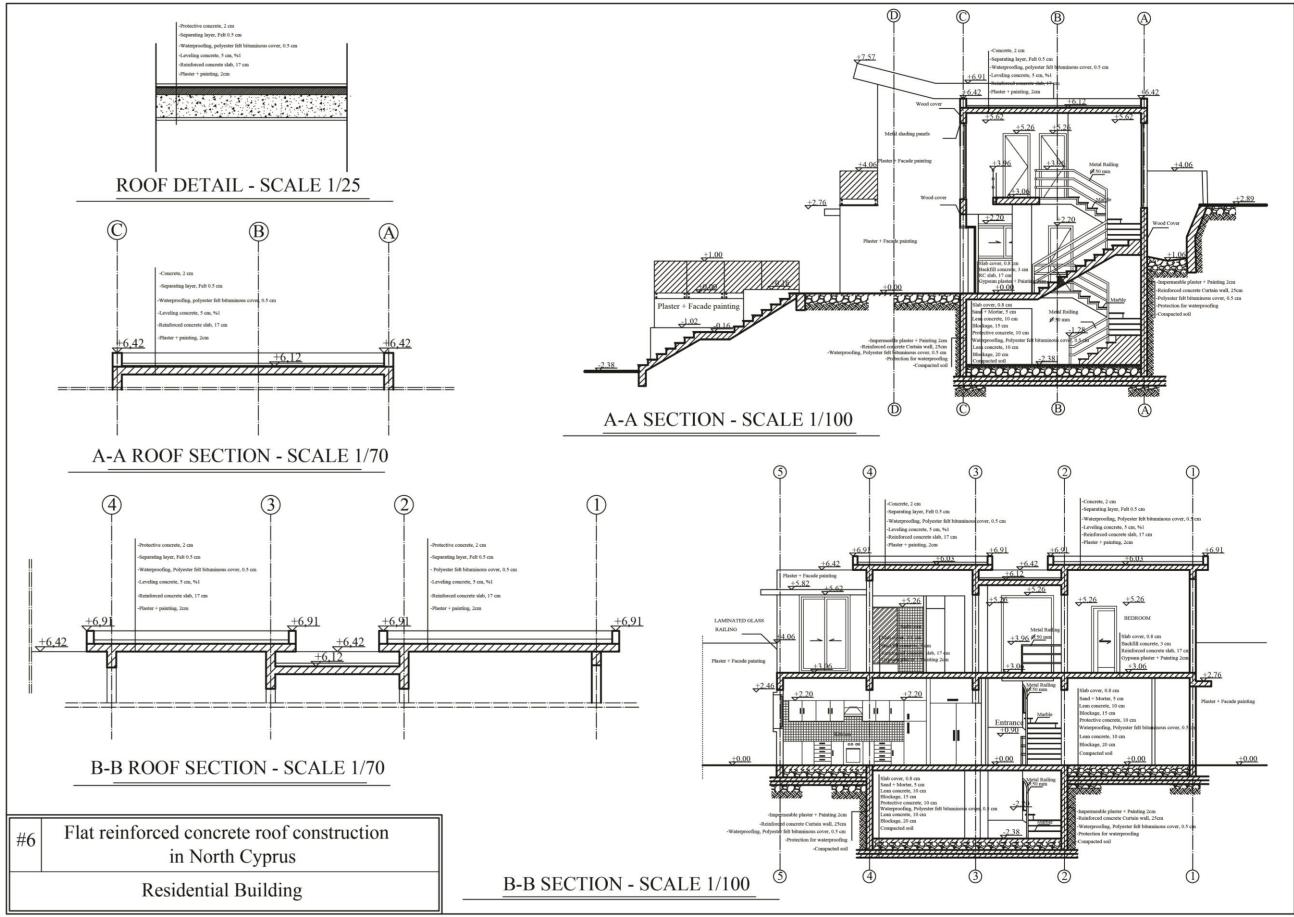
Flat reinforced concrete roof construction in North Cyprus
